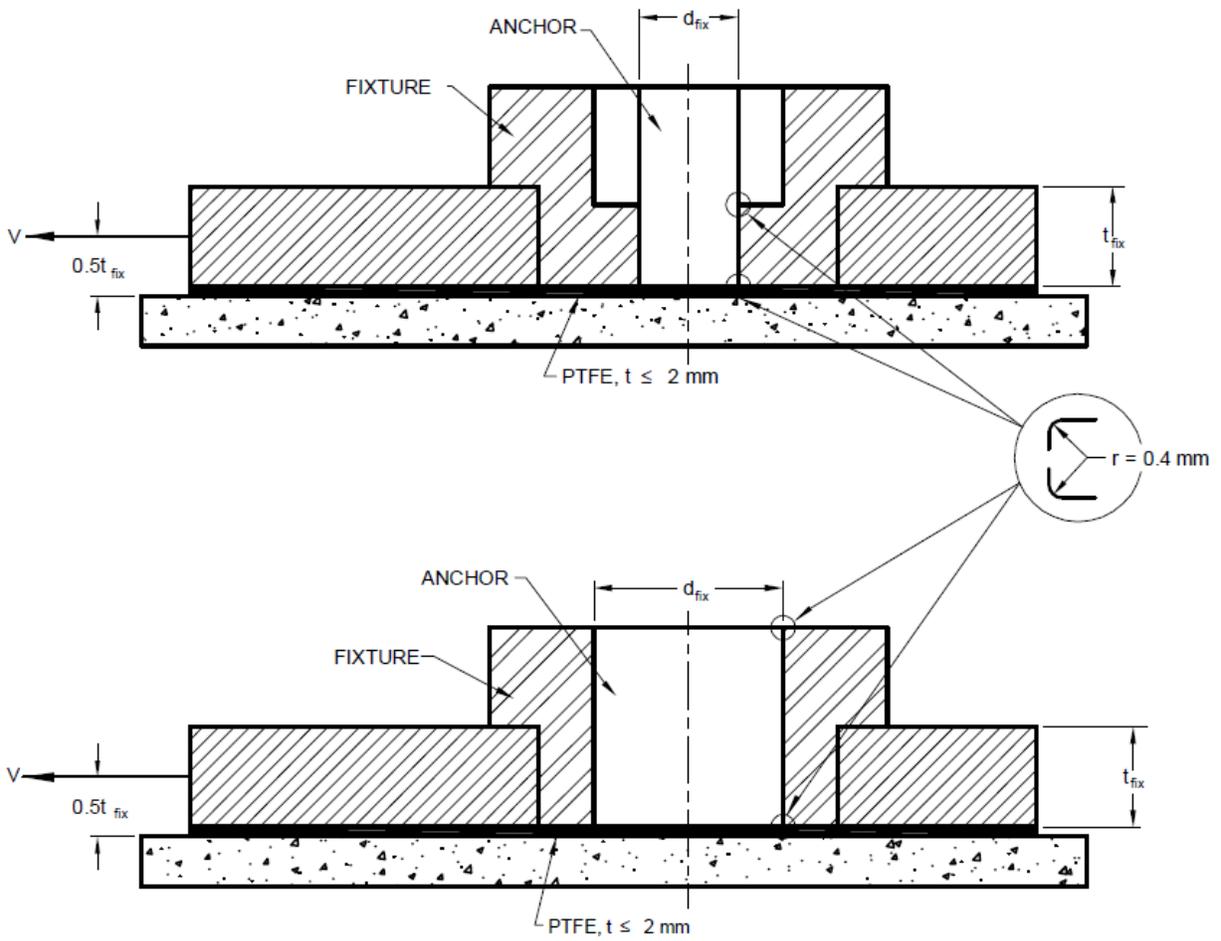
TYPICAL SHEAR TEST SETUP FIXTURE
